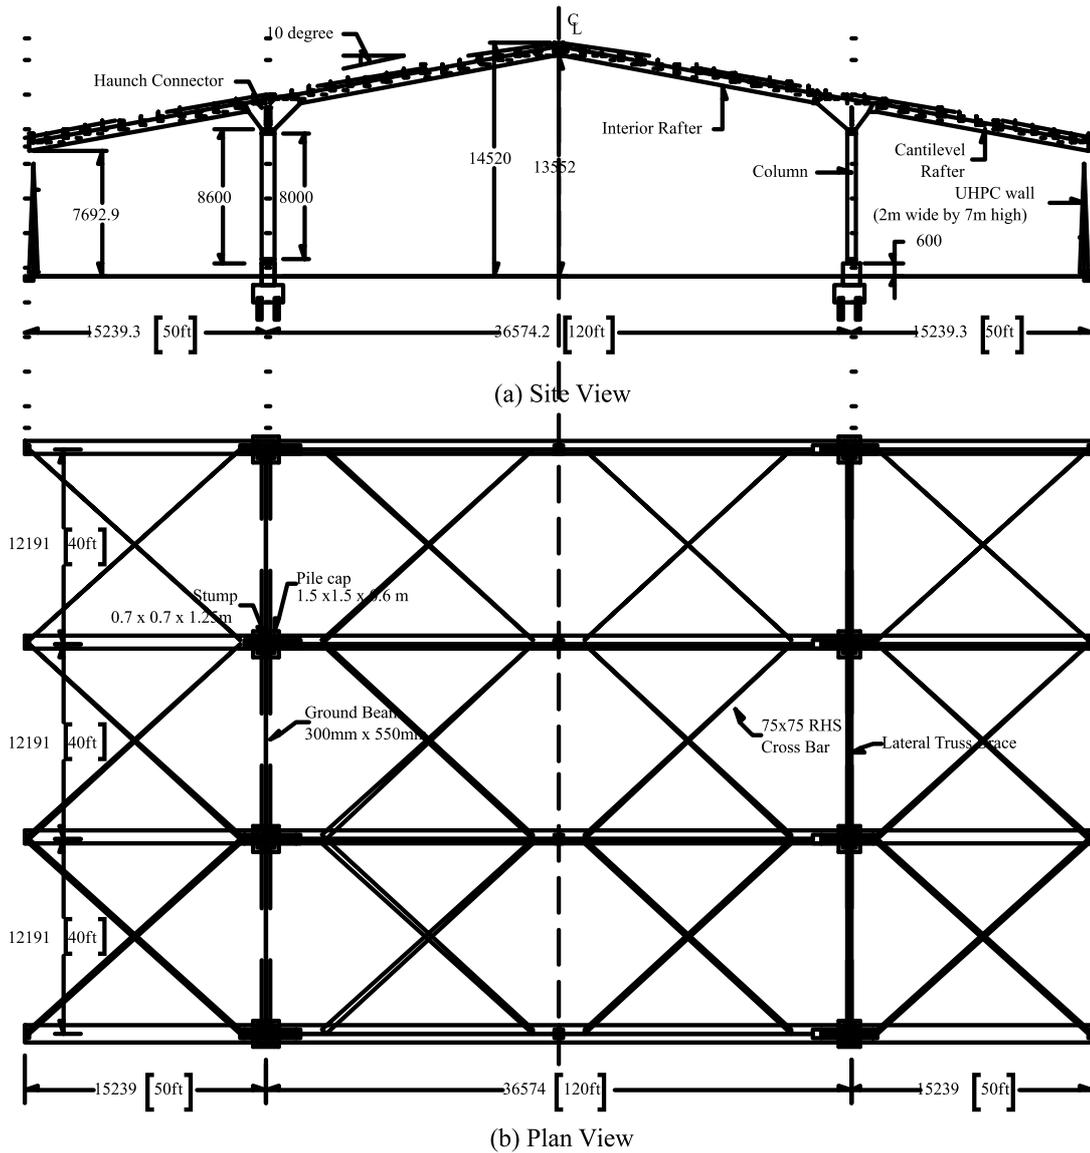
a) Side view and (b) plan view of Wilson Hall.
